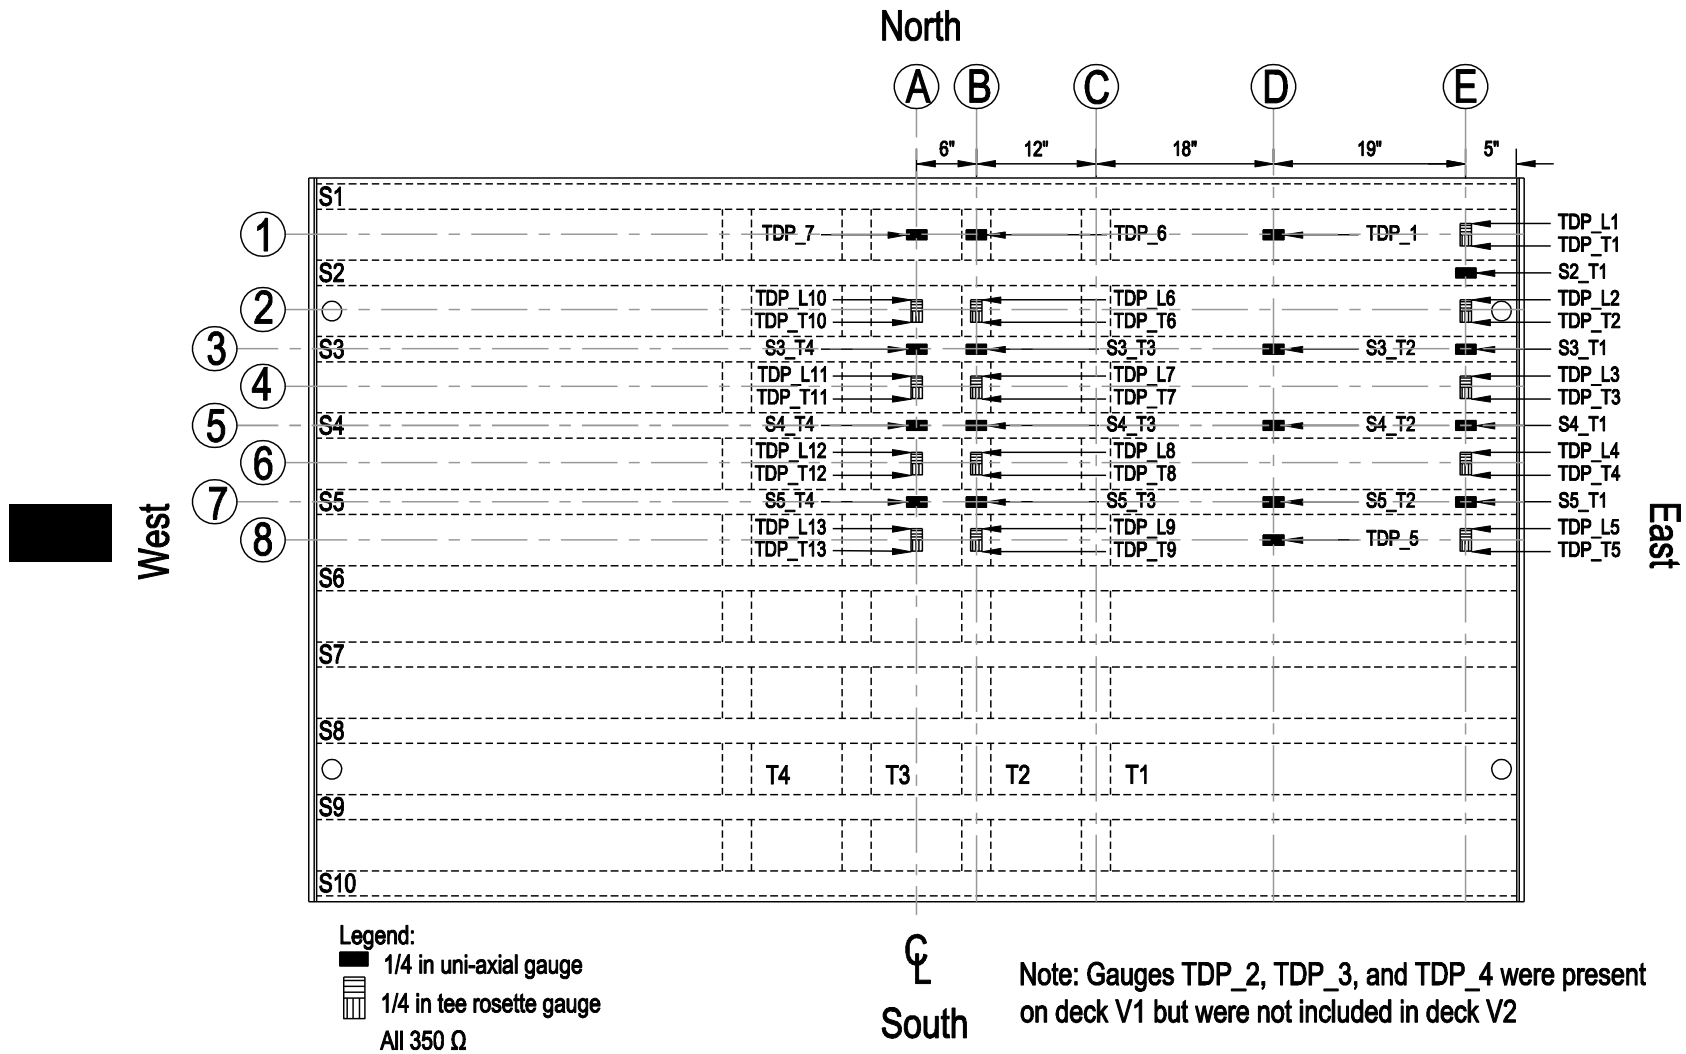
Strain gauge layout for Specimen #1 on top of deck plate
